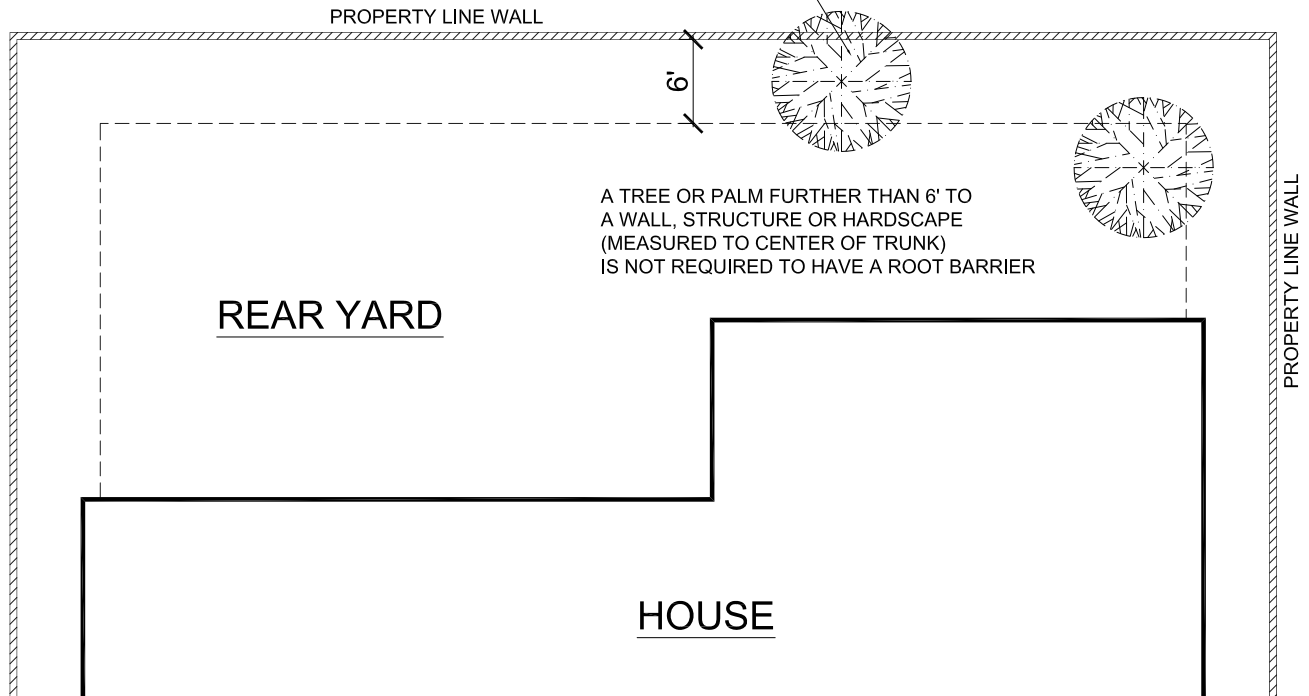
D: ROOT BARRIERS AT WALLS
